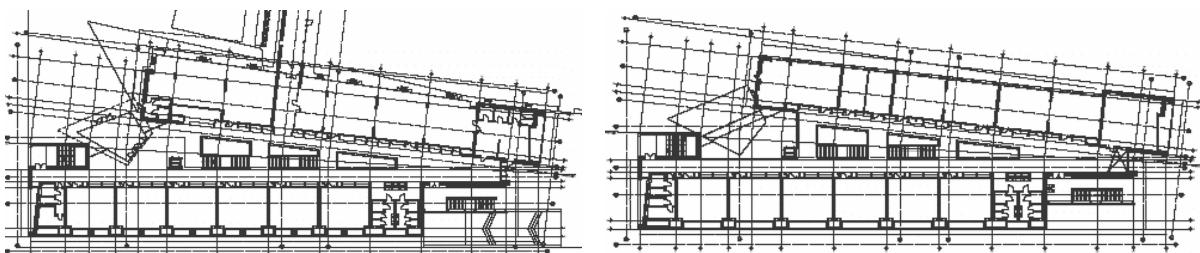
School building layout: plan of ground floor (left) and 2nd floor (right)
